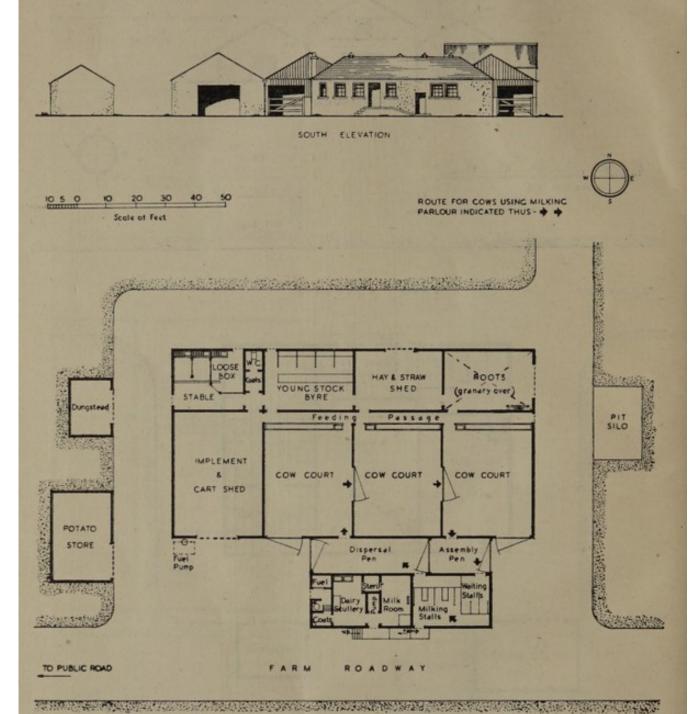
Plan N. Steading for Mixed Arable and Dairy Farm (Cow Court System) for 75 Acres
